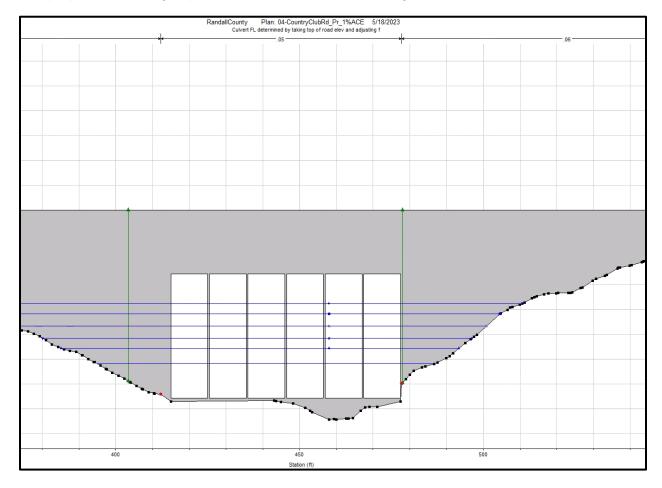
Proposed 1% LOS upstream cross section at Country Club Road crossing of unnamed stream east of IH-27.
